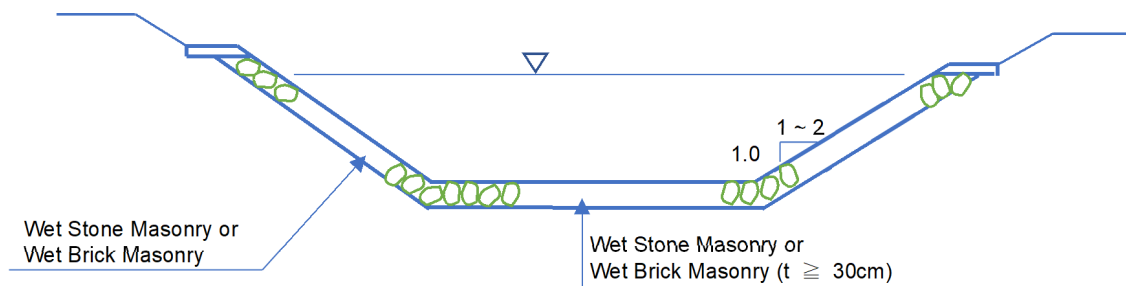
Typical Cross-Section of Wet Masonry Lining Canal
